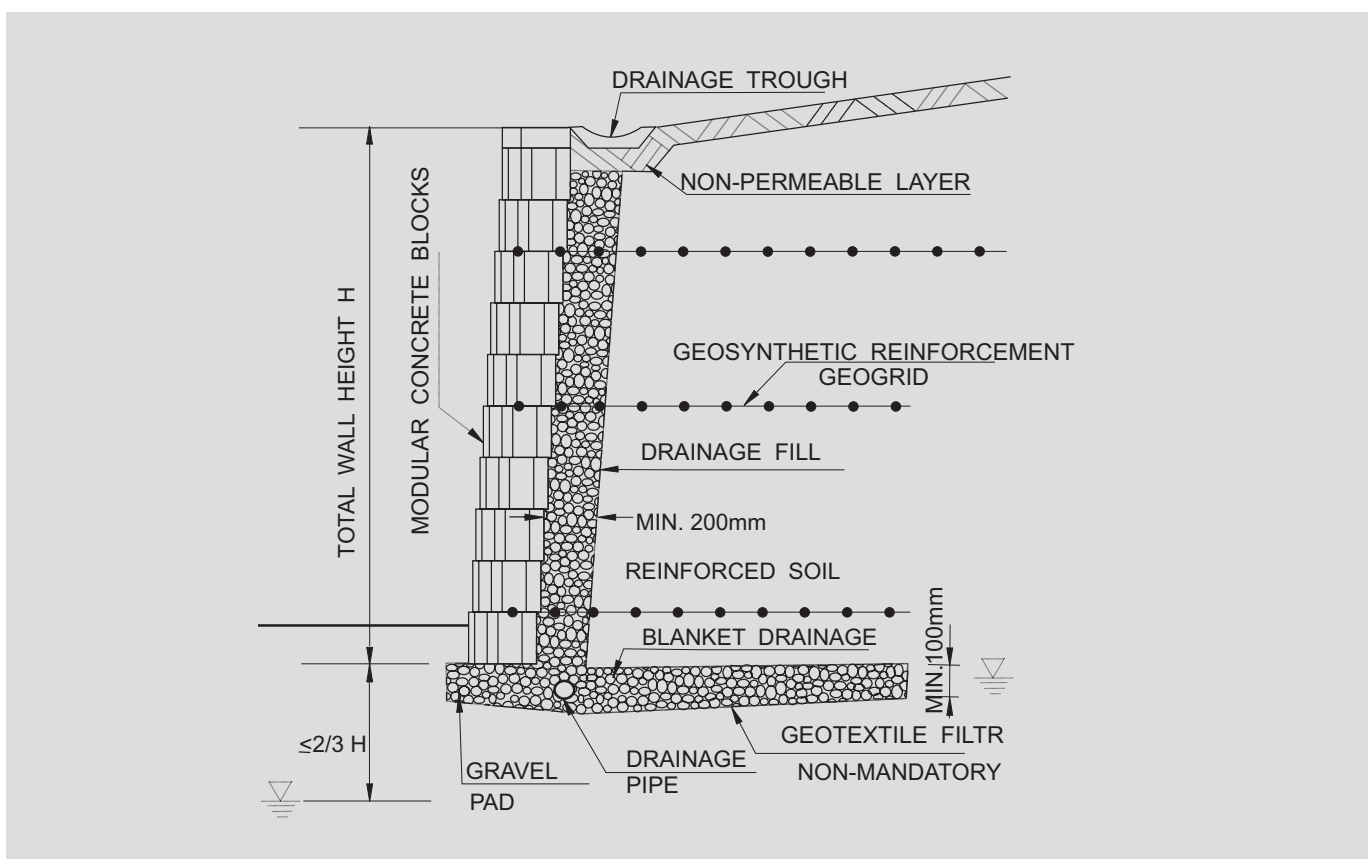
Typical section view of a retaining wall with blanket drainage
